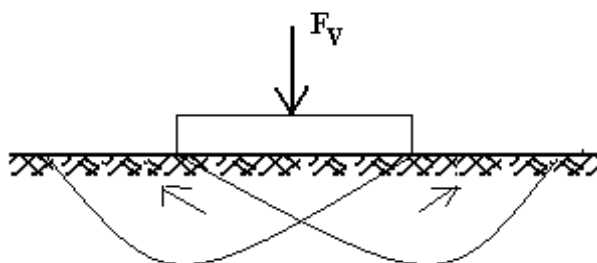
Expansion of the ground due to centered load on the foundation
